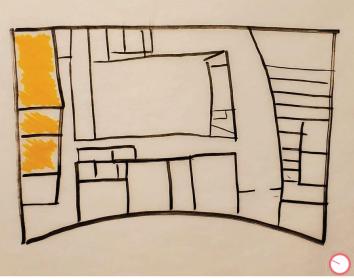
AUTHOR'S SKETCH OF THIRD FLOOR PLAN
